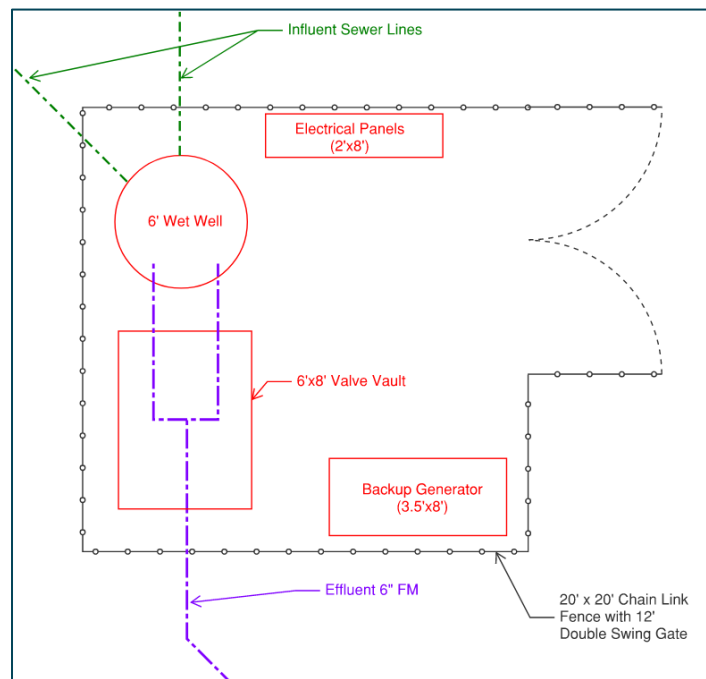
Conceptual Charter Oaks Pump Station Layout
